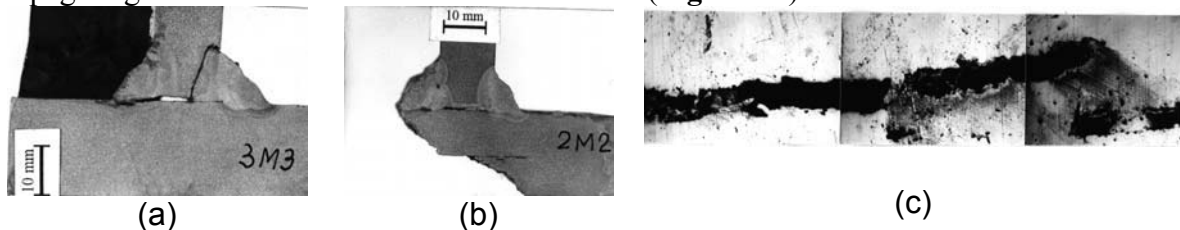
Cracking of the end plate and beam flange HAZ (a), cracking of end plate (b), and non-metallic inclusion in the left end plate of the BX-SU-C1 specimen (c)
